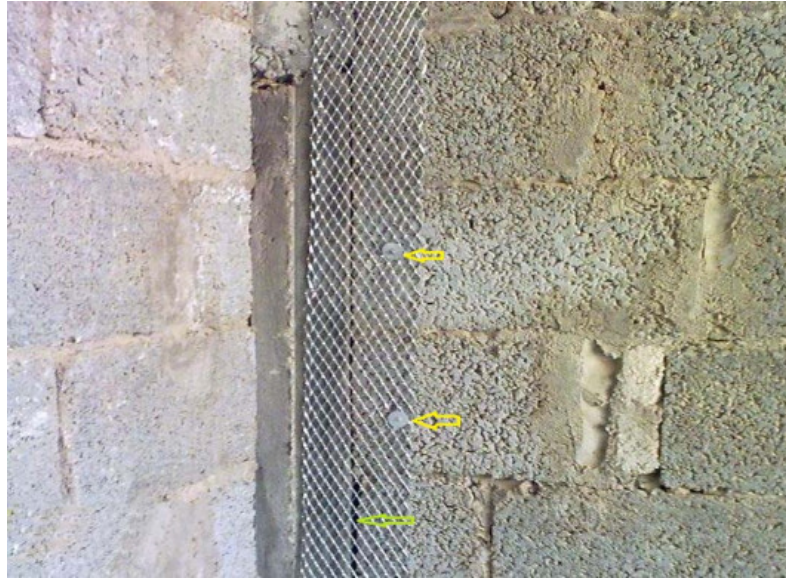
Plastering must be placed in all joints and corners in the building to avoid any cracks
